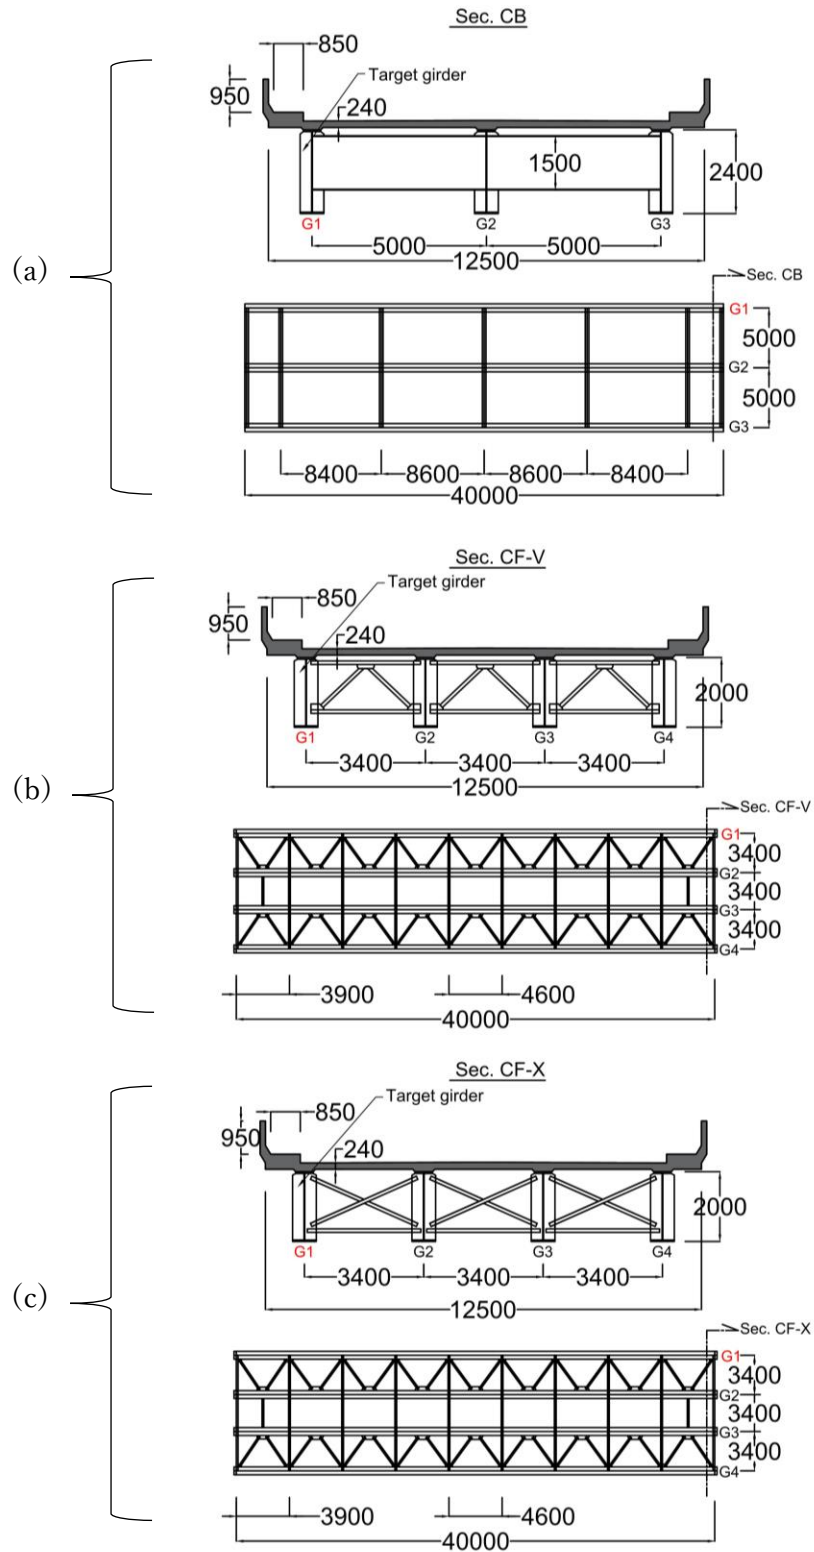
Various of simply supported steel I girder roadway bridge overall view. (a) steel bridge with cross beam (CB) bracing; (b) steel bridge with cross frame V bracing (CF-V); (c) steel bridge with cross frame X bracing (CF-X). (Unit: mm)
